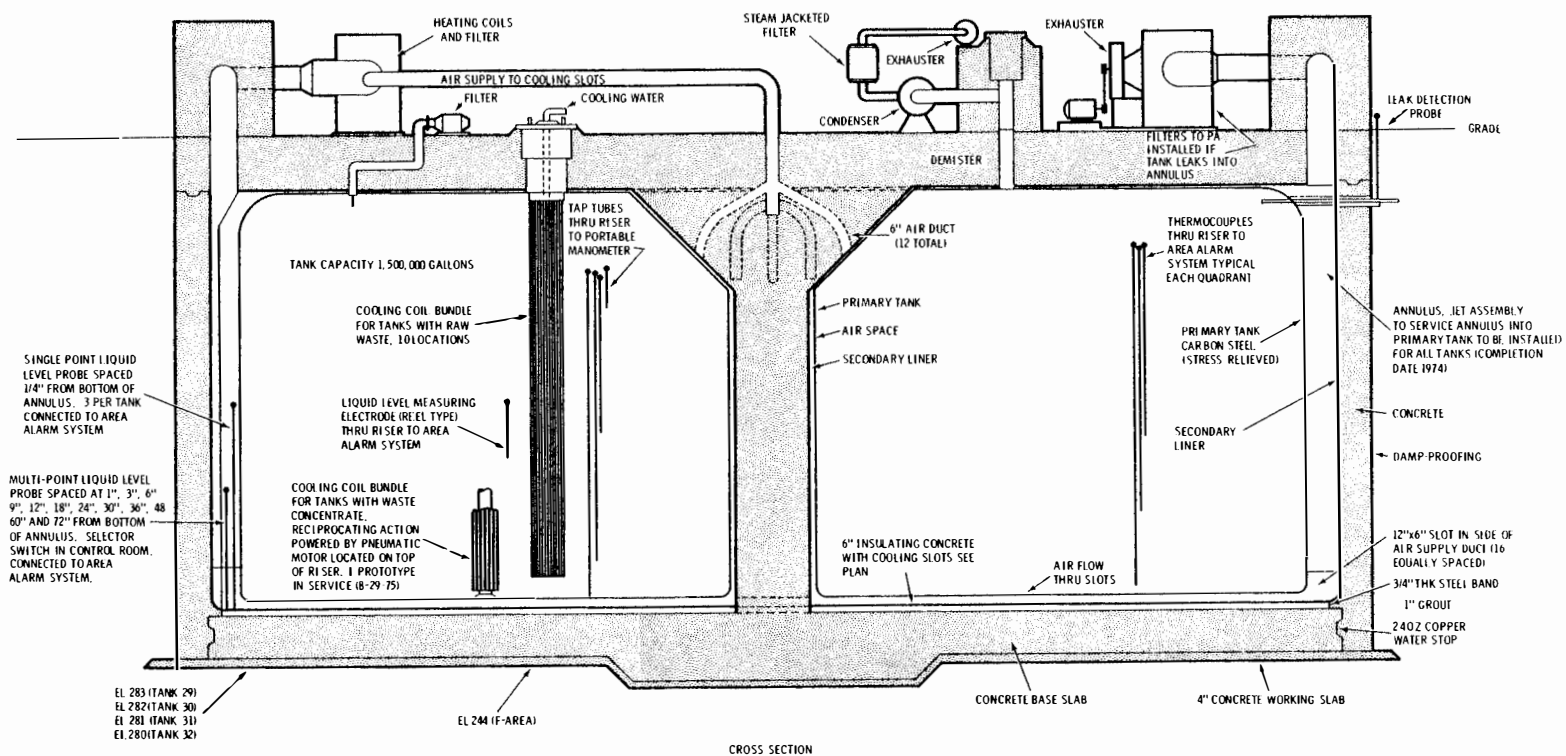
Type III Waste Storage Tanks (Building 241-F: Tanks 33-34, 1969-72; Tanks 25-28, 1975-78) (Building 241-H: Tanks 29-32, 1967-70; Tanks 35-37, 1974-77)
